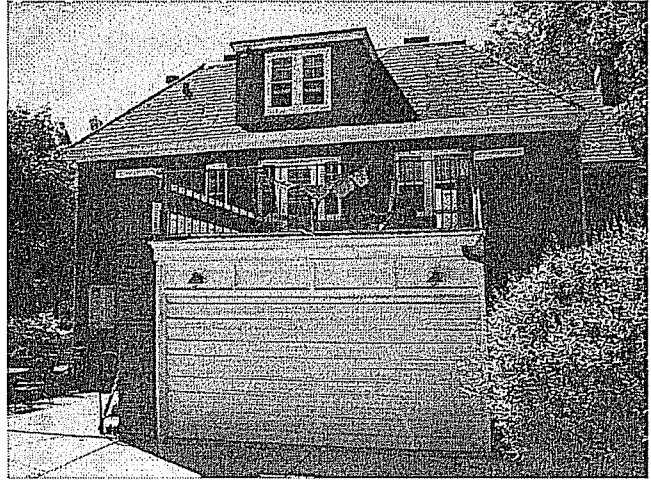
SOUTH ELEVATION (SHOWS EXISTING GARAGE)
